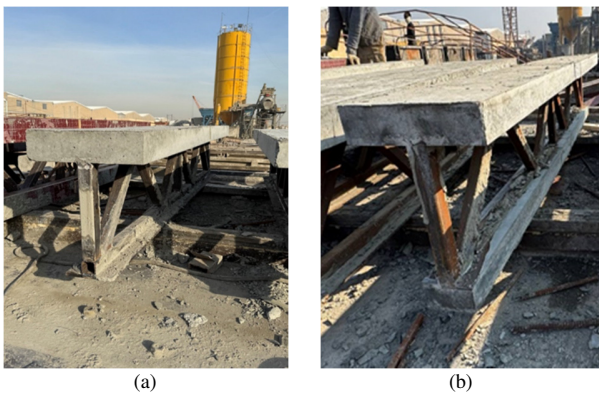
Concrete casting of the main truss girder: (a) concrete casting stage of SCTG, (b) concrete casting stage of DCTG.
